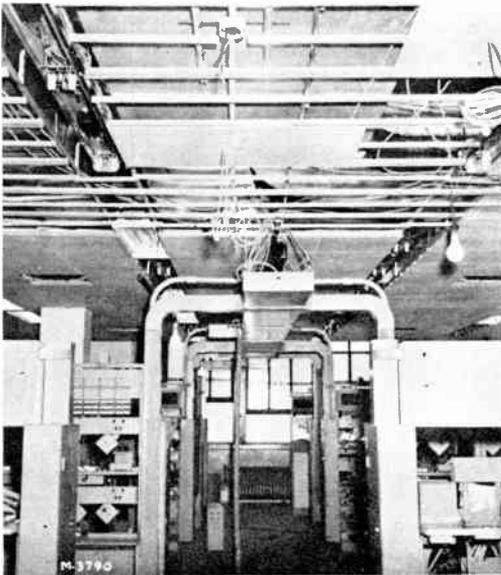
Installation of ventilating duct, dropped ceiling, acoustic treatment and lighting fixtures—Philadelphia
